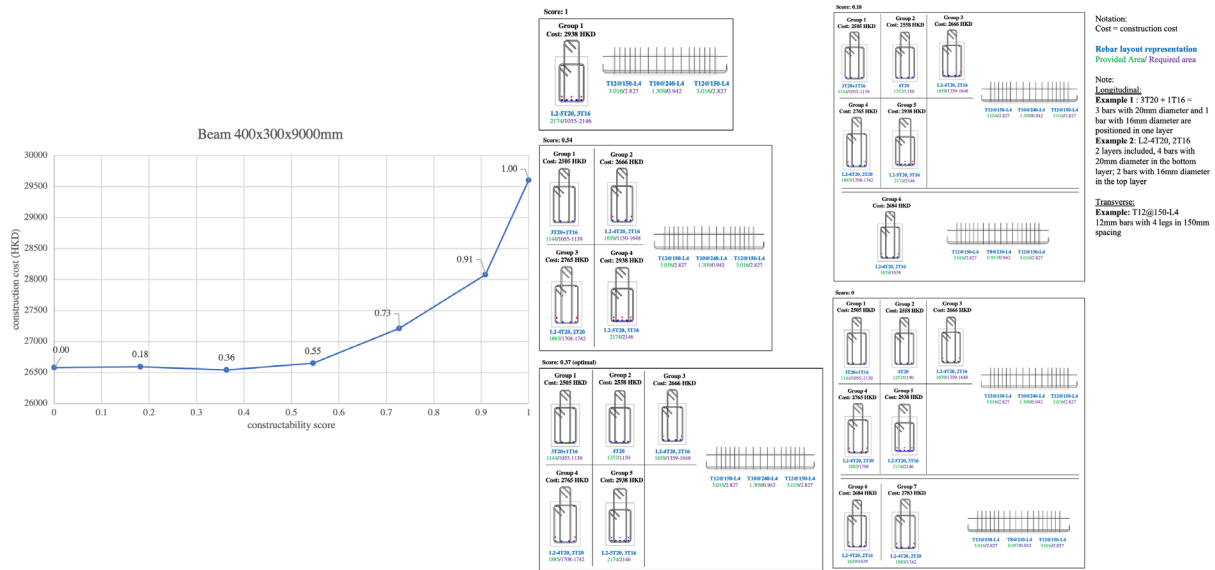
Rebar detailing of beam group 400 x 300 x 9000 mm according to different constructability scores
